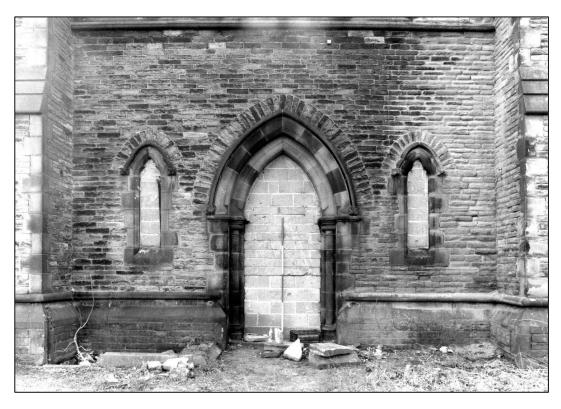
Base of north gable of west elevation, looking E (photo 1/10).
